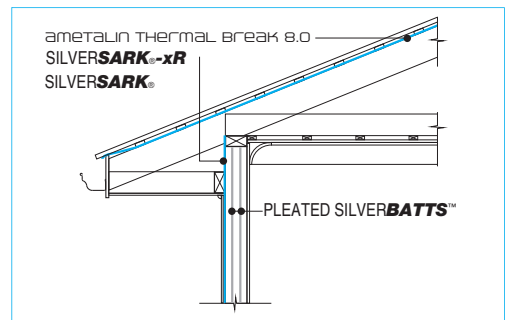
Typical residential 22° pitched metal roof, flat ceiling, one layer of Ametalin product and two layers of PLEATED SILVERBATTSTM.
